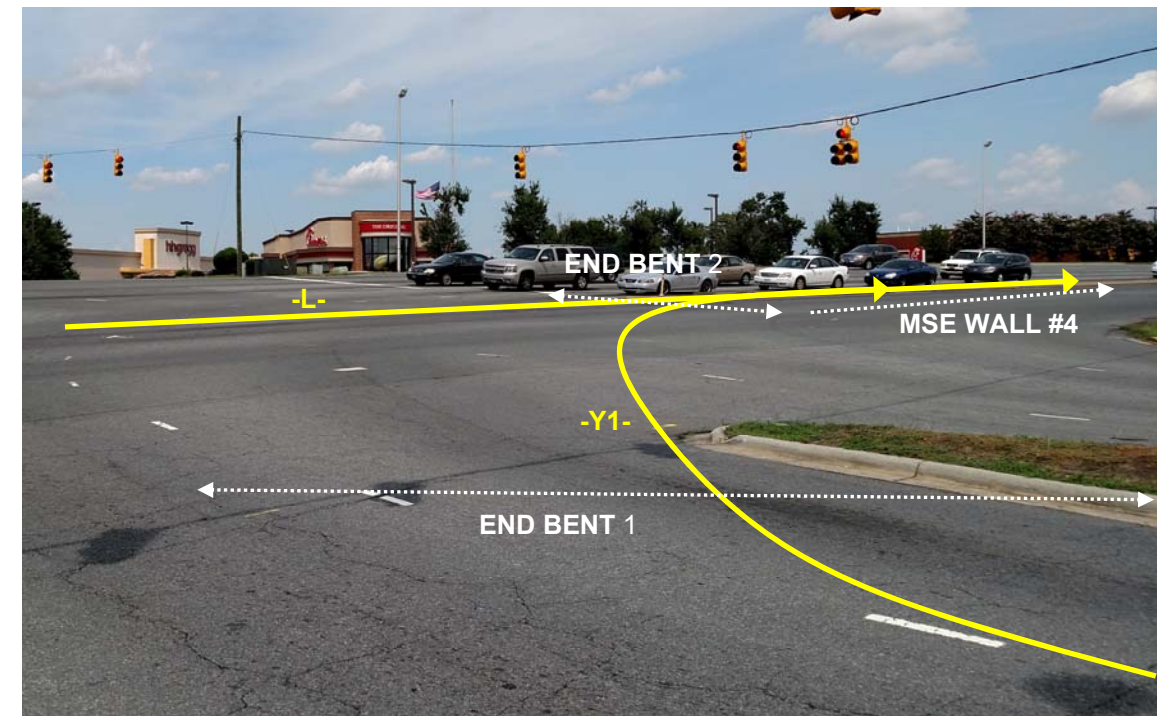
Looking west at -L- (Concord Mills Blvd.) and walls on -Y1-
